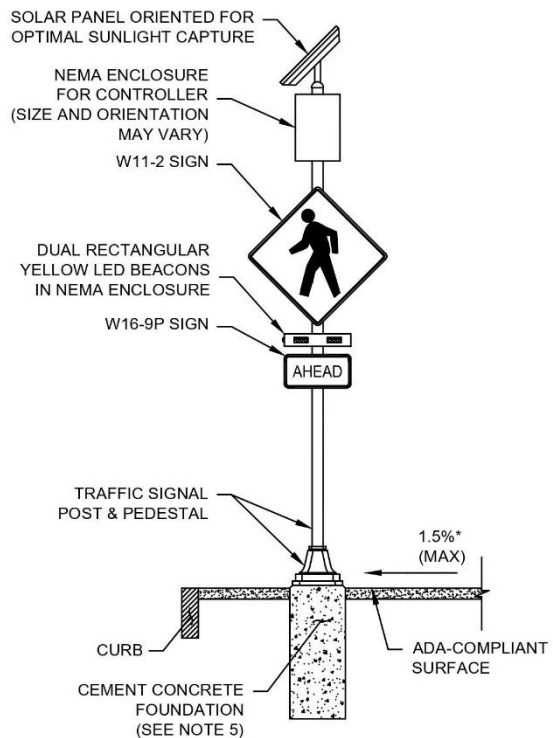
DETAIL: RECTANGULAR RAPID FLASHING BEACON (LOCATION 15)
